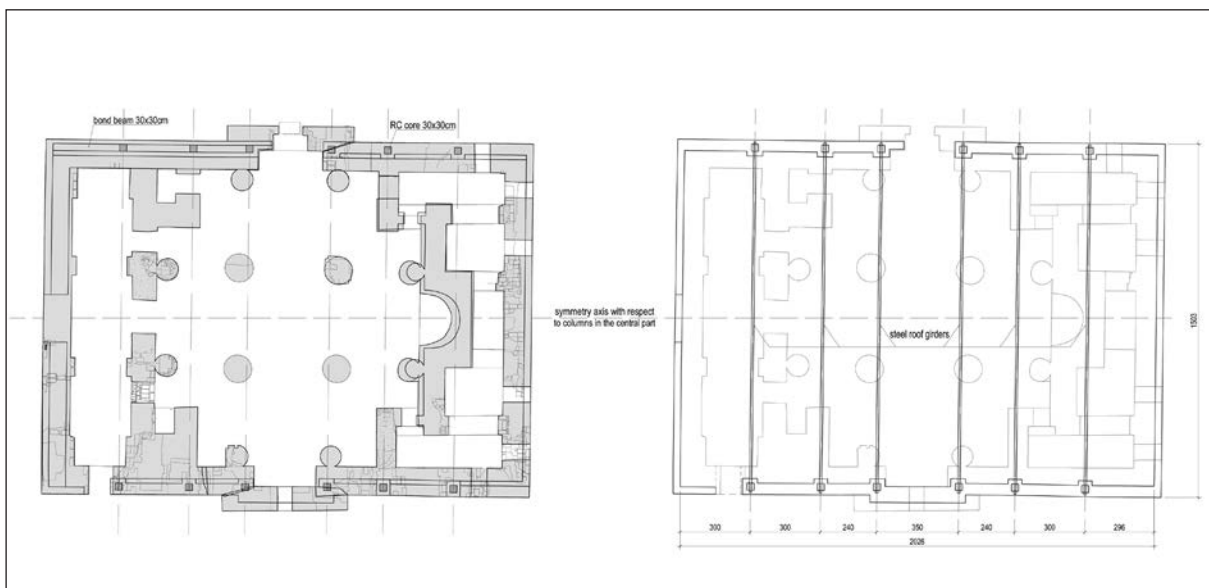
Plan view of the Church of Archangel Raphael (SWN.B.V): left, distribution of reinforced concrete elements in relation to the preserved walls of the building; right, distribution of the steel girders on the walls
